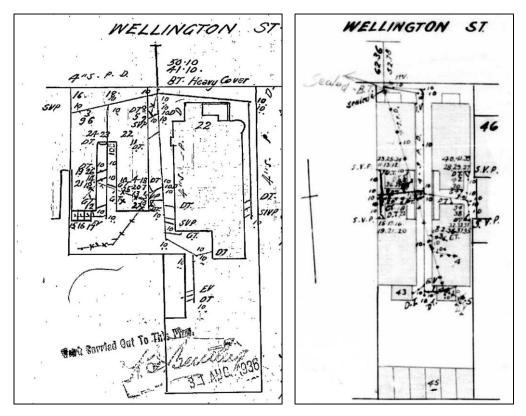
1935 Property Service Plan for 16-20A Wellington Street (left) and 1932 Property Service Plan for 44 Wellington Street (right). Source: South-East Water.
